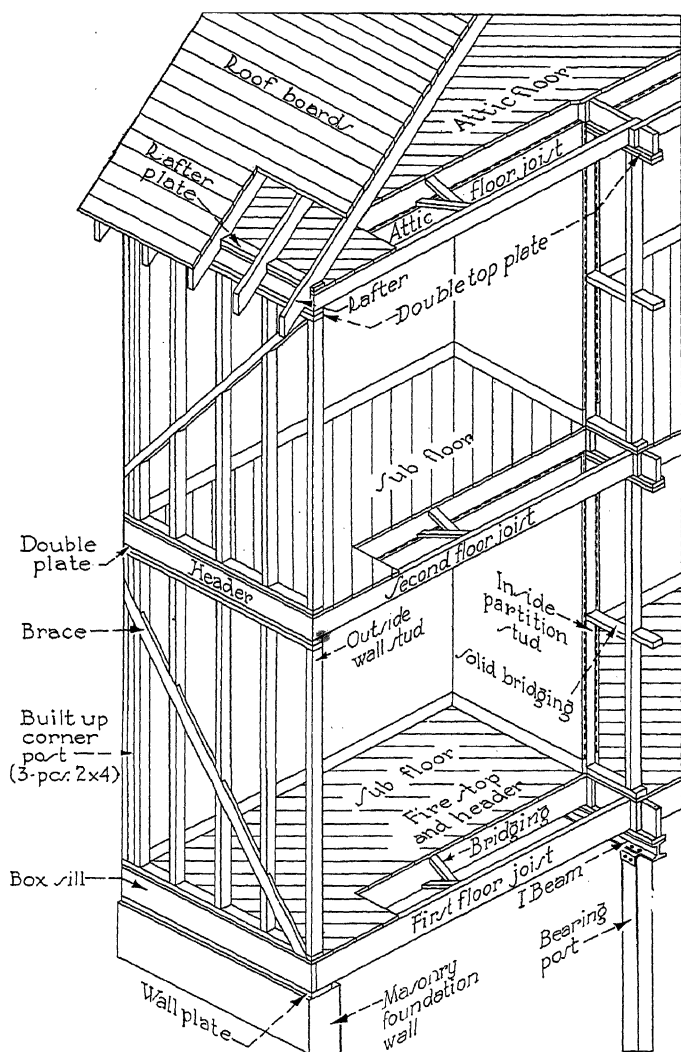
The above illustration shows details of the platform-frame type of construction, in which each story is built as a separate unit. Note settlement is equalized by making the height of horizontal timbers the same in exterior walls and interior partitions. (Courtesy of U. S. Bureau of Standards.)
